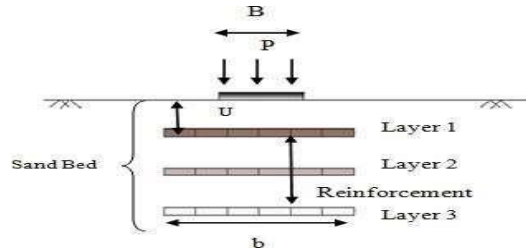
Layout and configuration three dimensional reinforcement layers in the test.
